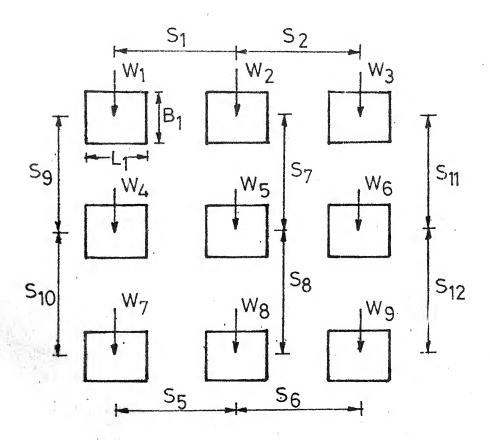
PLAN SHOWING THE GROUP OF FOOTINGS
